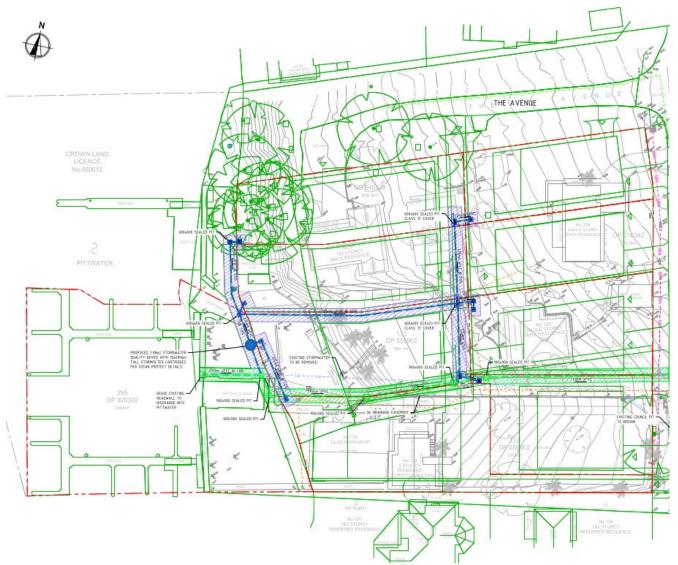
Siteworks and Drainage Plan (CI-0200) extract illustrating the location of the proposed works within the foreshore area
